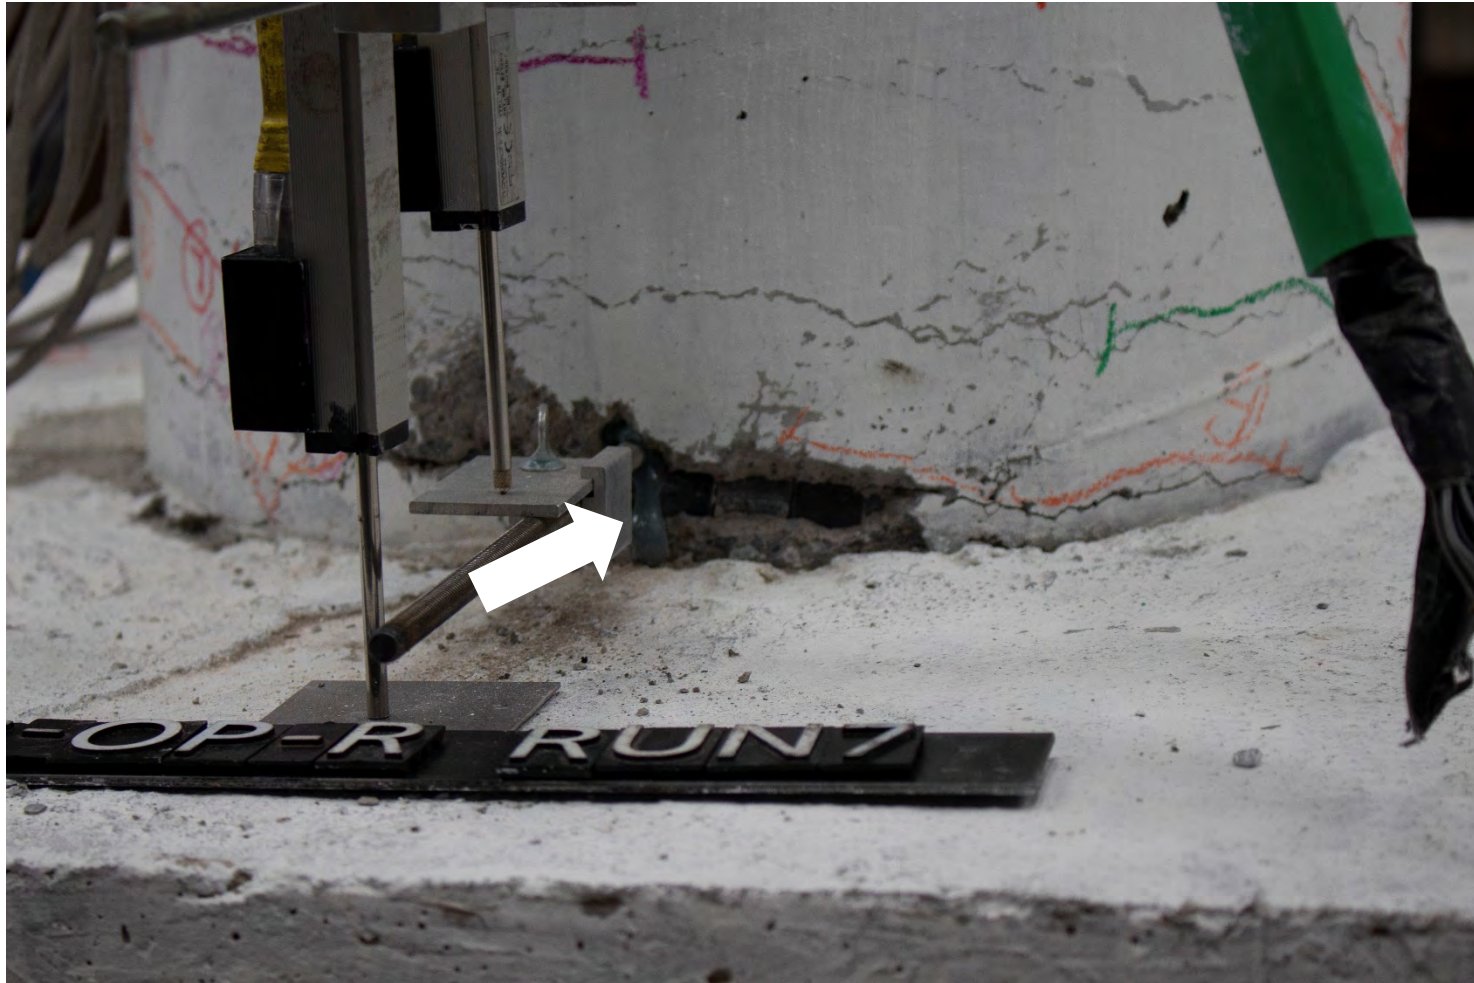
Exposed spiral reinforcement in the north side (run #7)
